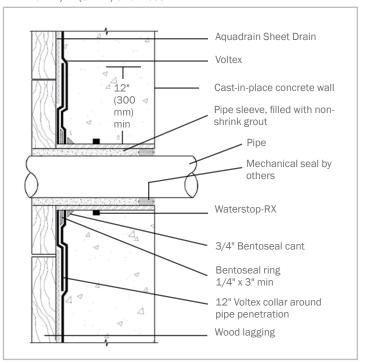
SLEEVED WALL PENETRATION - Cut and secure Voltex tightly around penetrations and then apply Bentoseal 3/4" (18 mm) ring around penetration and extend over membrane a min. 3" (75 mm).
